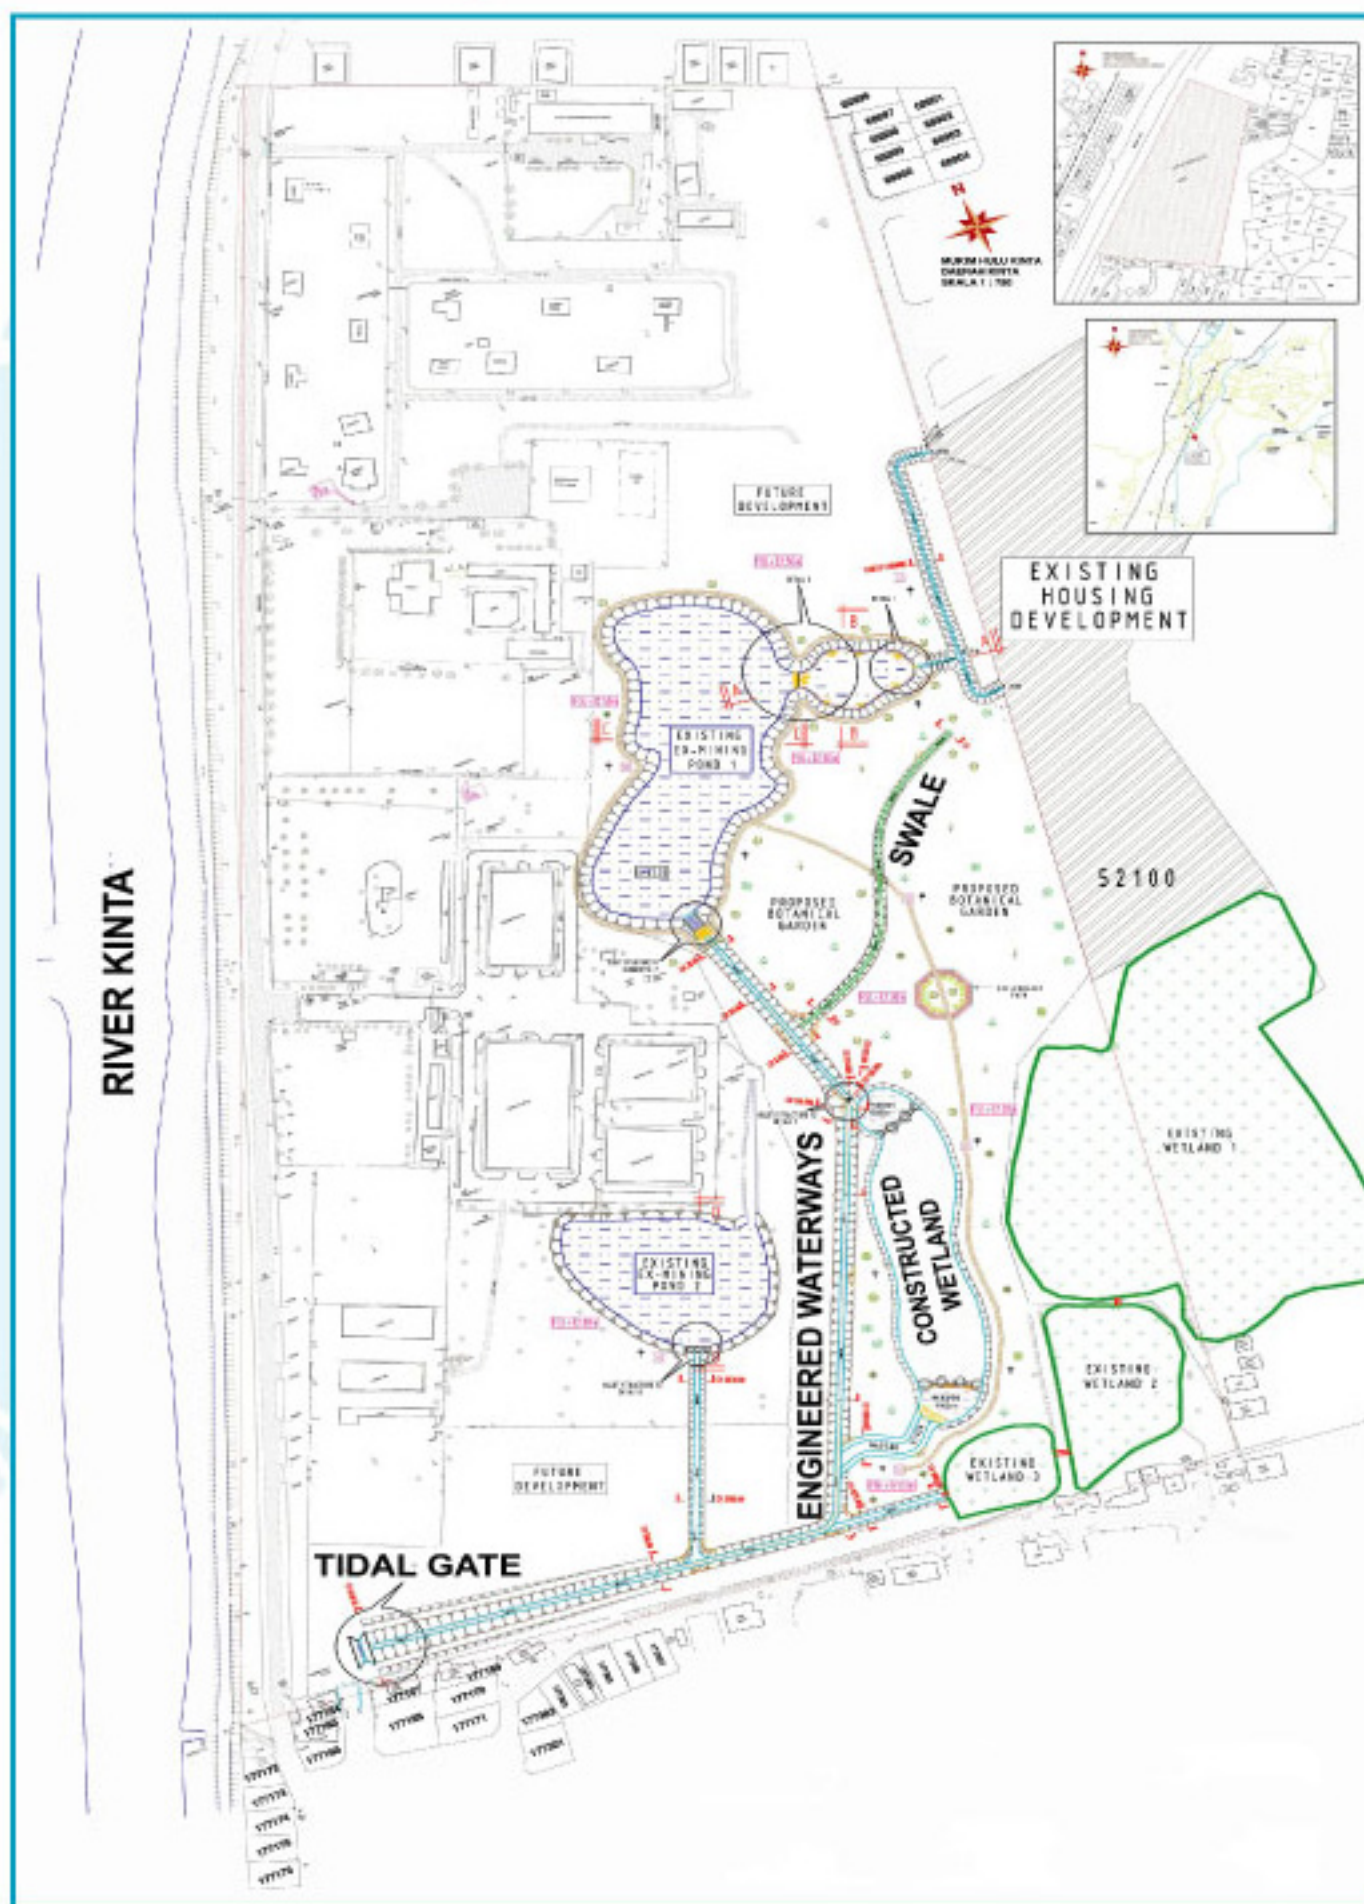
Layout of Integrated Stormwater Facilities at DID Mechanical Section, Ipoh.
